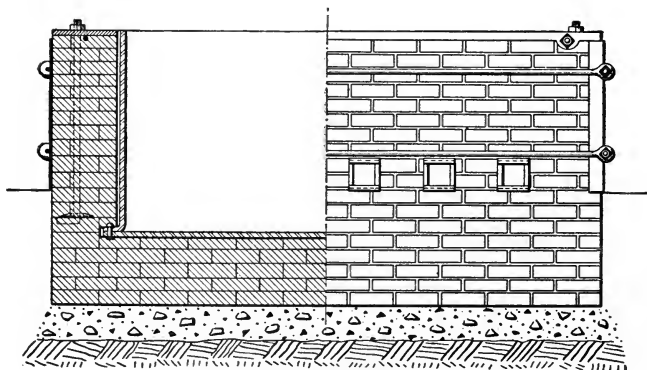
SIDE ELEVATION AT B B, FIG. 15
